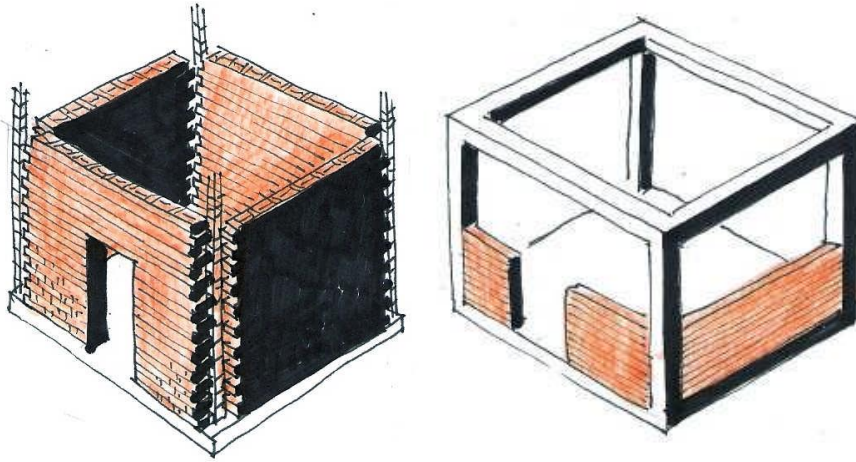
difference between confined masonry system and reinforced concrete frames with masonry in filled, (Sdc, 2007).
